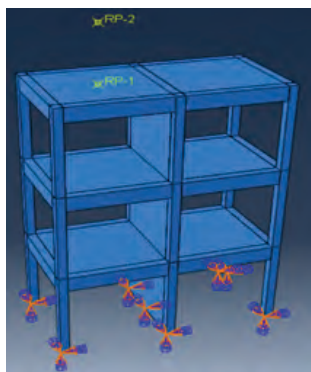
RC frame with shear wall and fixed boundary condition at ends of column and shear wall.
